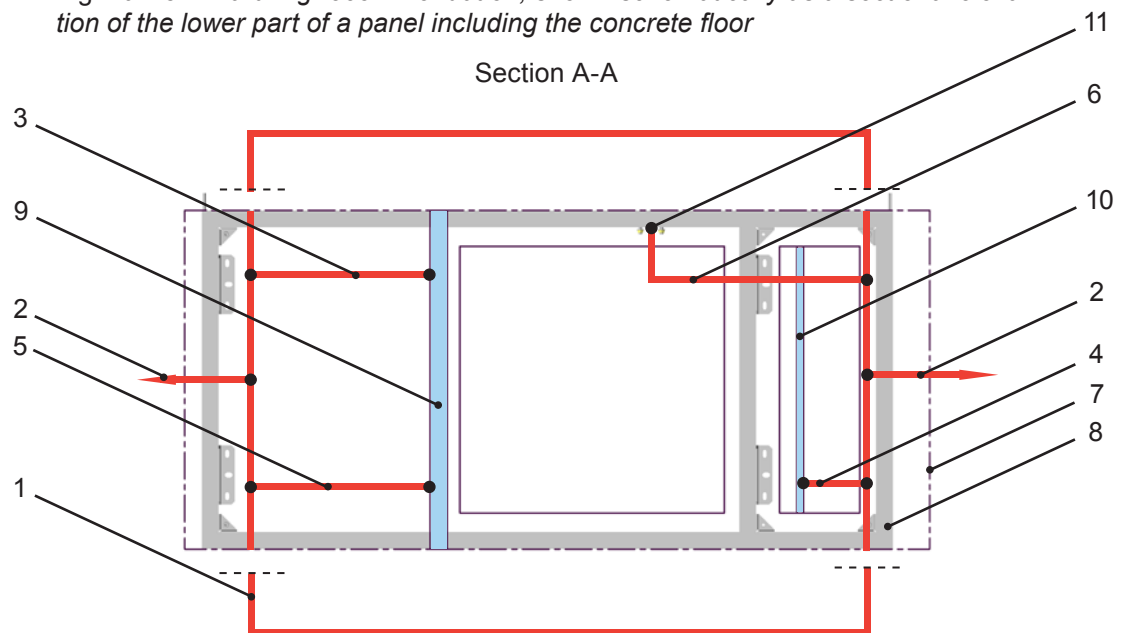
Earthing recommendation, plan view (section A-A of figure 10.7.3.1)
